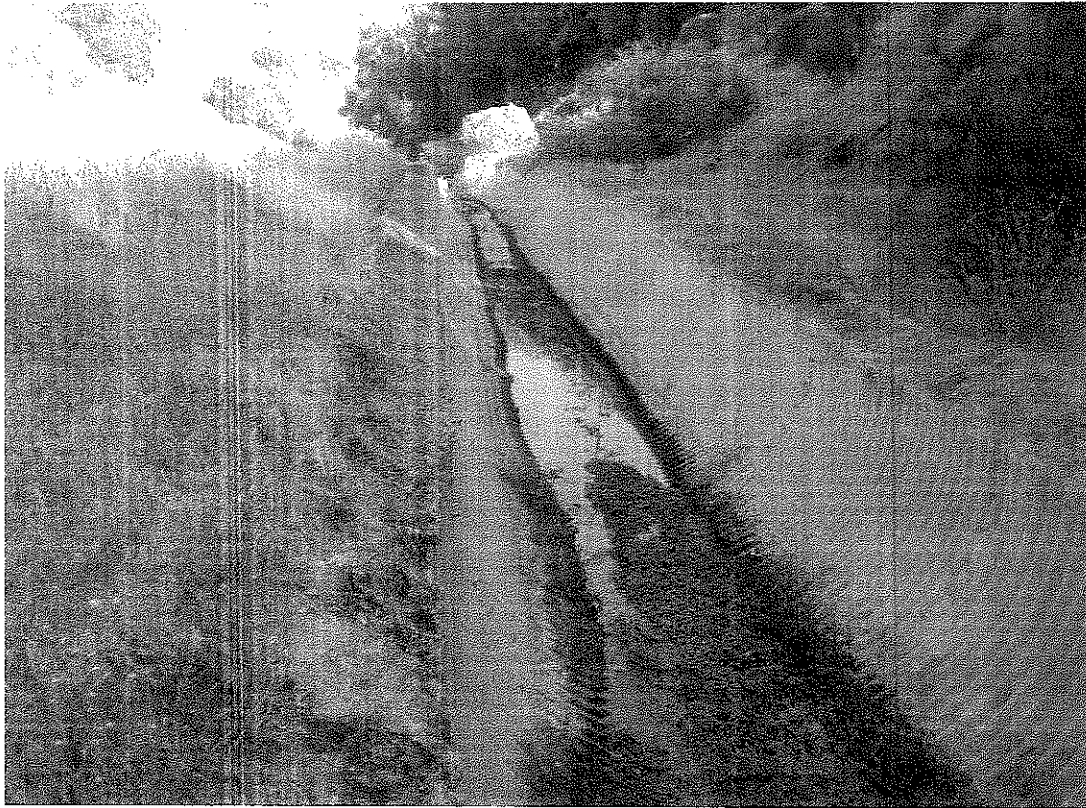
Discharged area from Pond 13 into Permanente Creek (open culvert).
